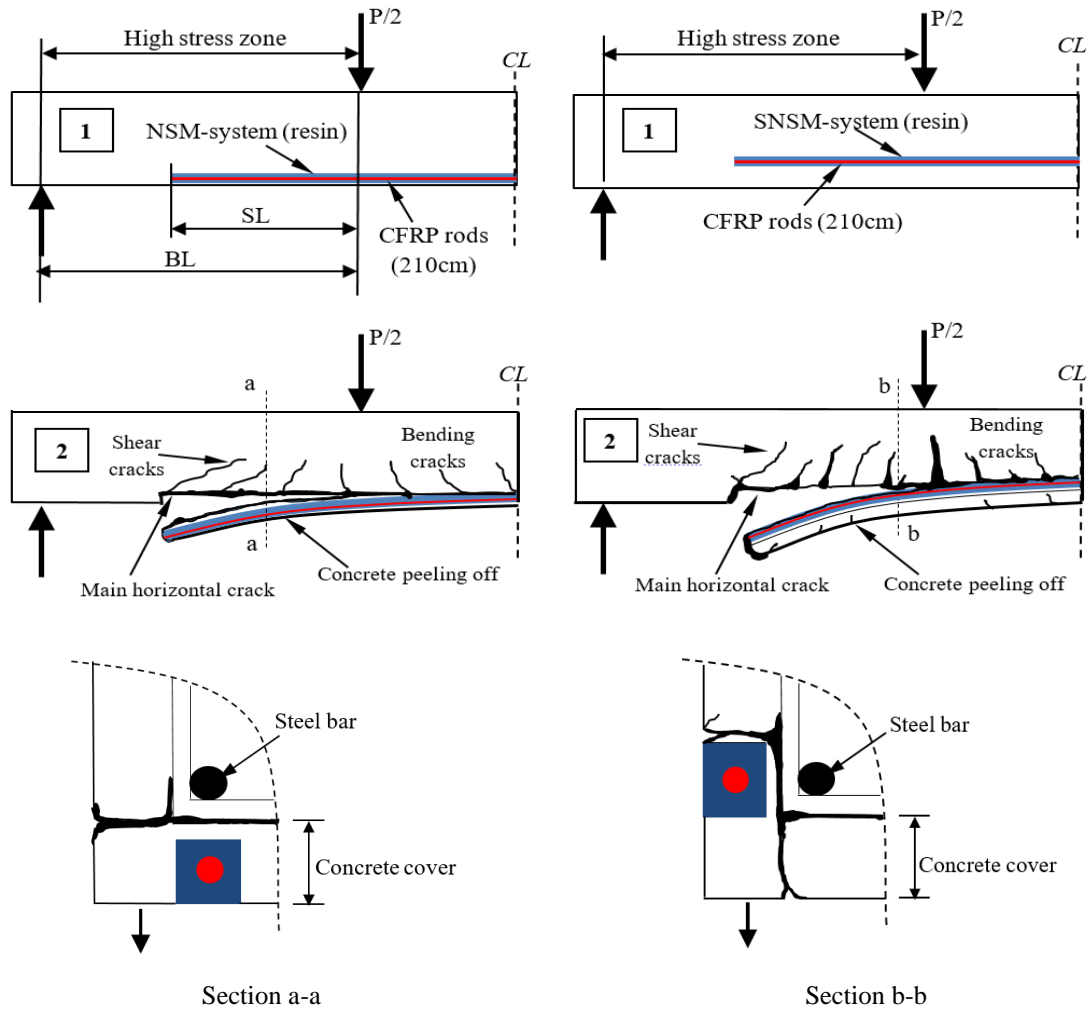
Peeling off failure mechanism of: a) BC2(210-SR) beam and b) S-C6(210-R) beam
